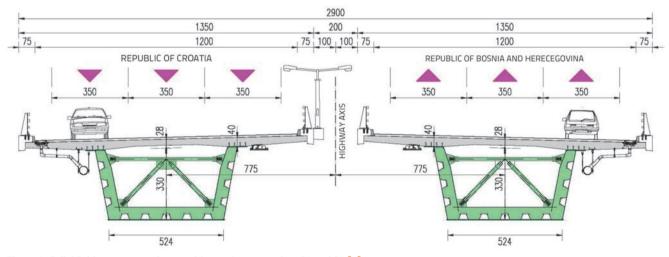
Svilaj Bridge cross-section at mid-span between piers S3 and S4 [4]
